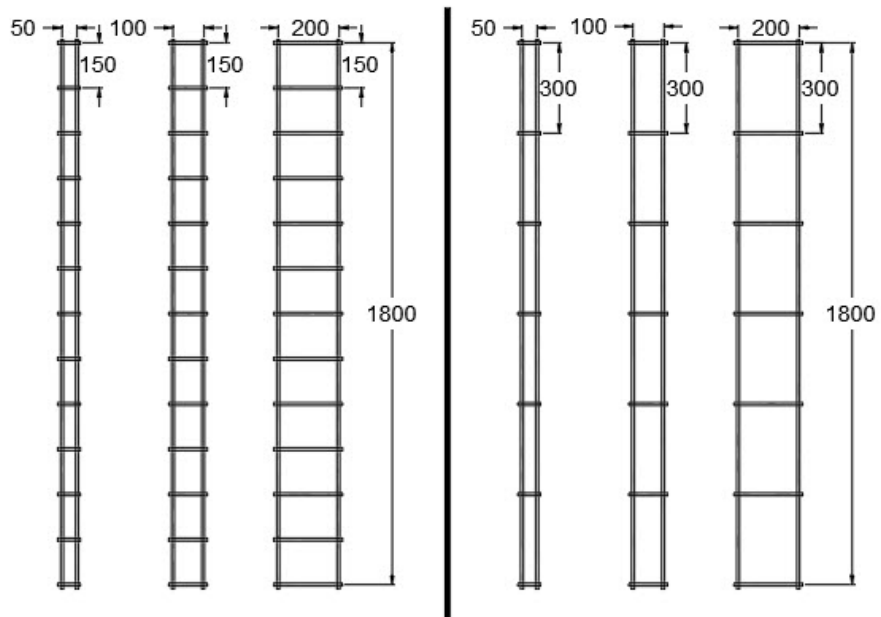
Plan View 2-Wire Soil-Reinforcing Elements
